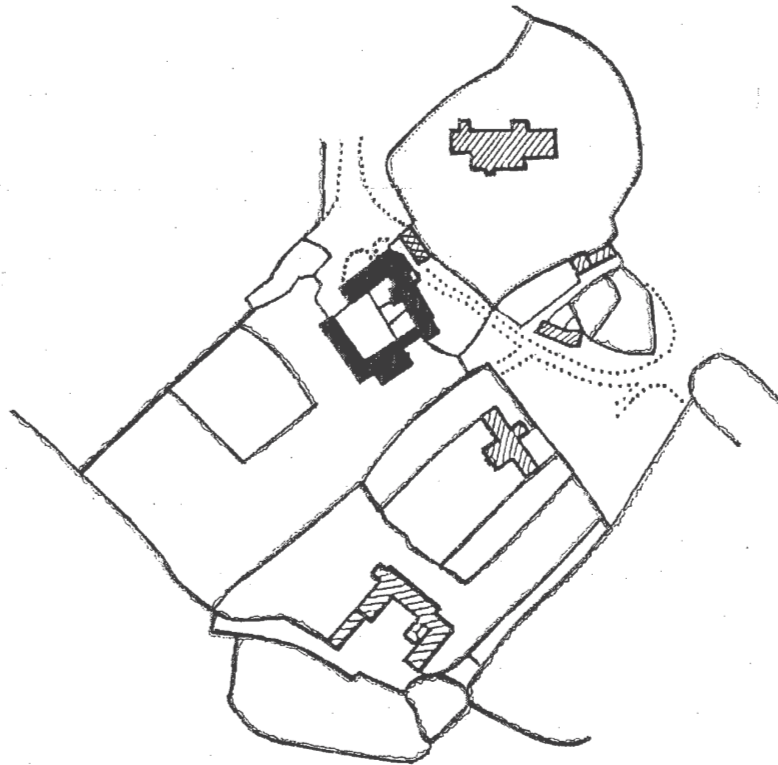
Site Location – Church Farm, Orton-on-the-Hill
